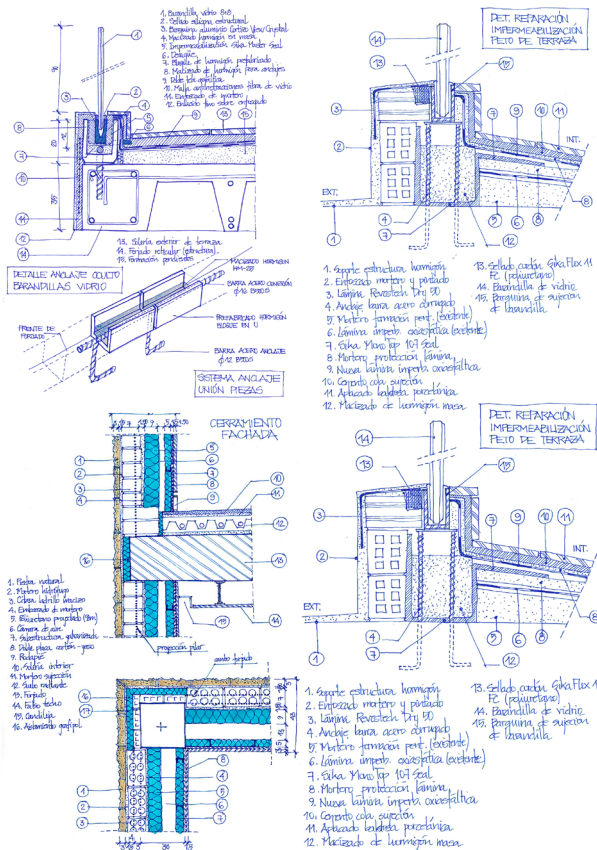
Construction details of joints and connections on-site (graphic elaboration by the authors).
